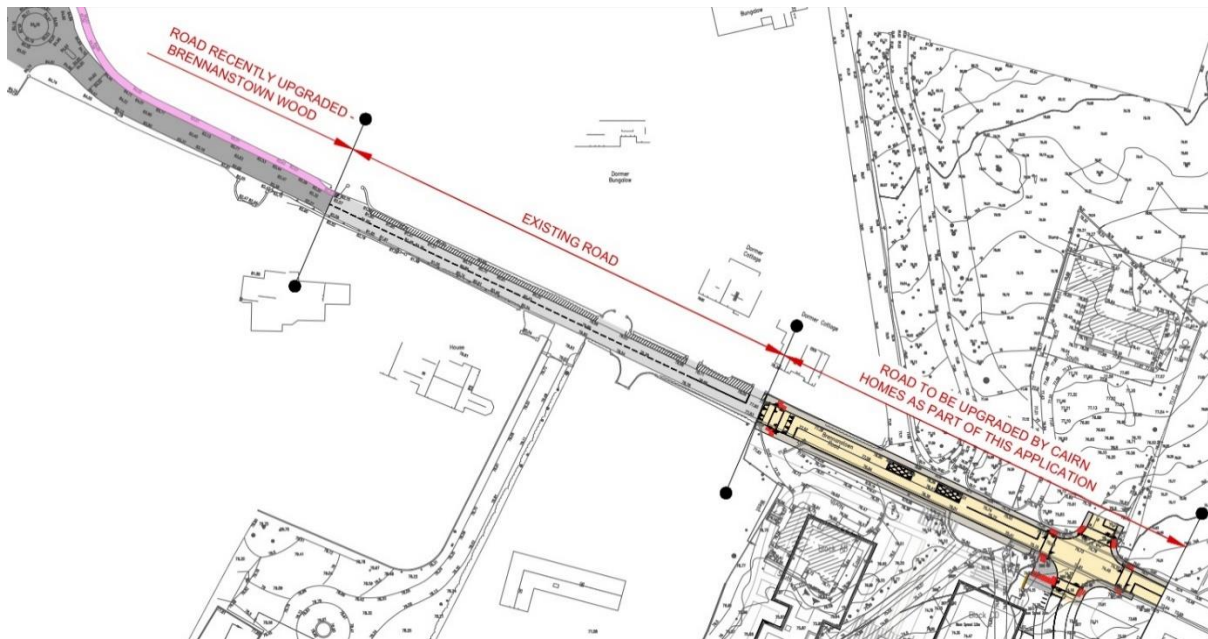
Proposed and current upgrades to Brennanstown Road
